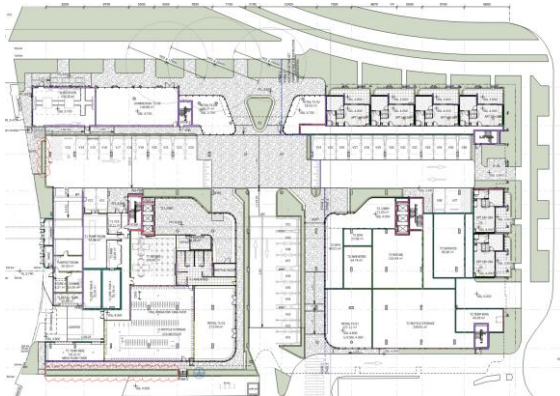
Architectural Overall Plan – Level 01 (Ground)
